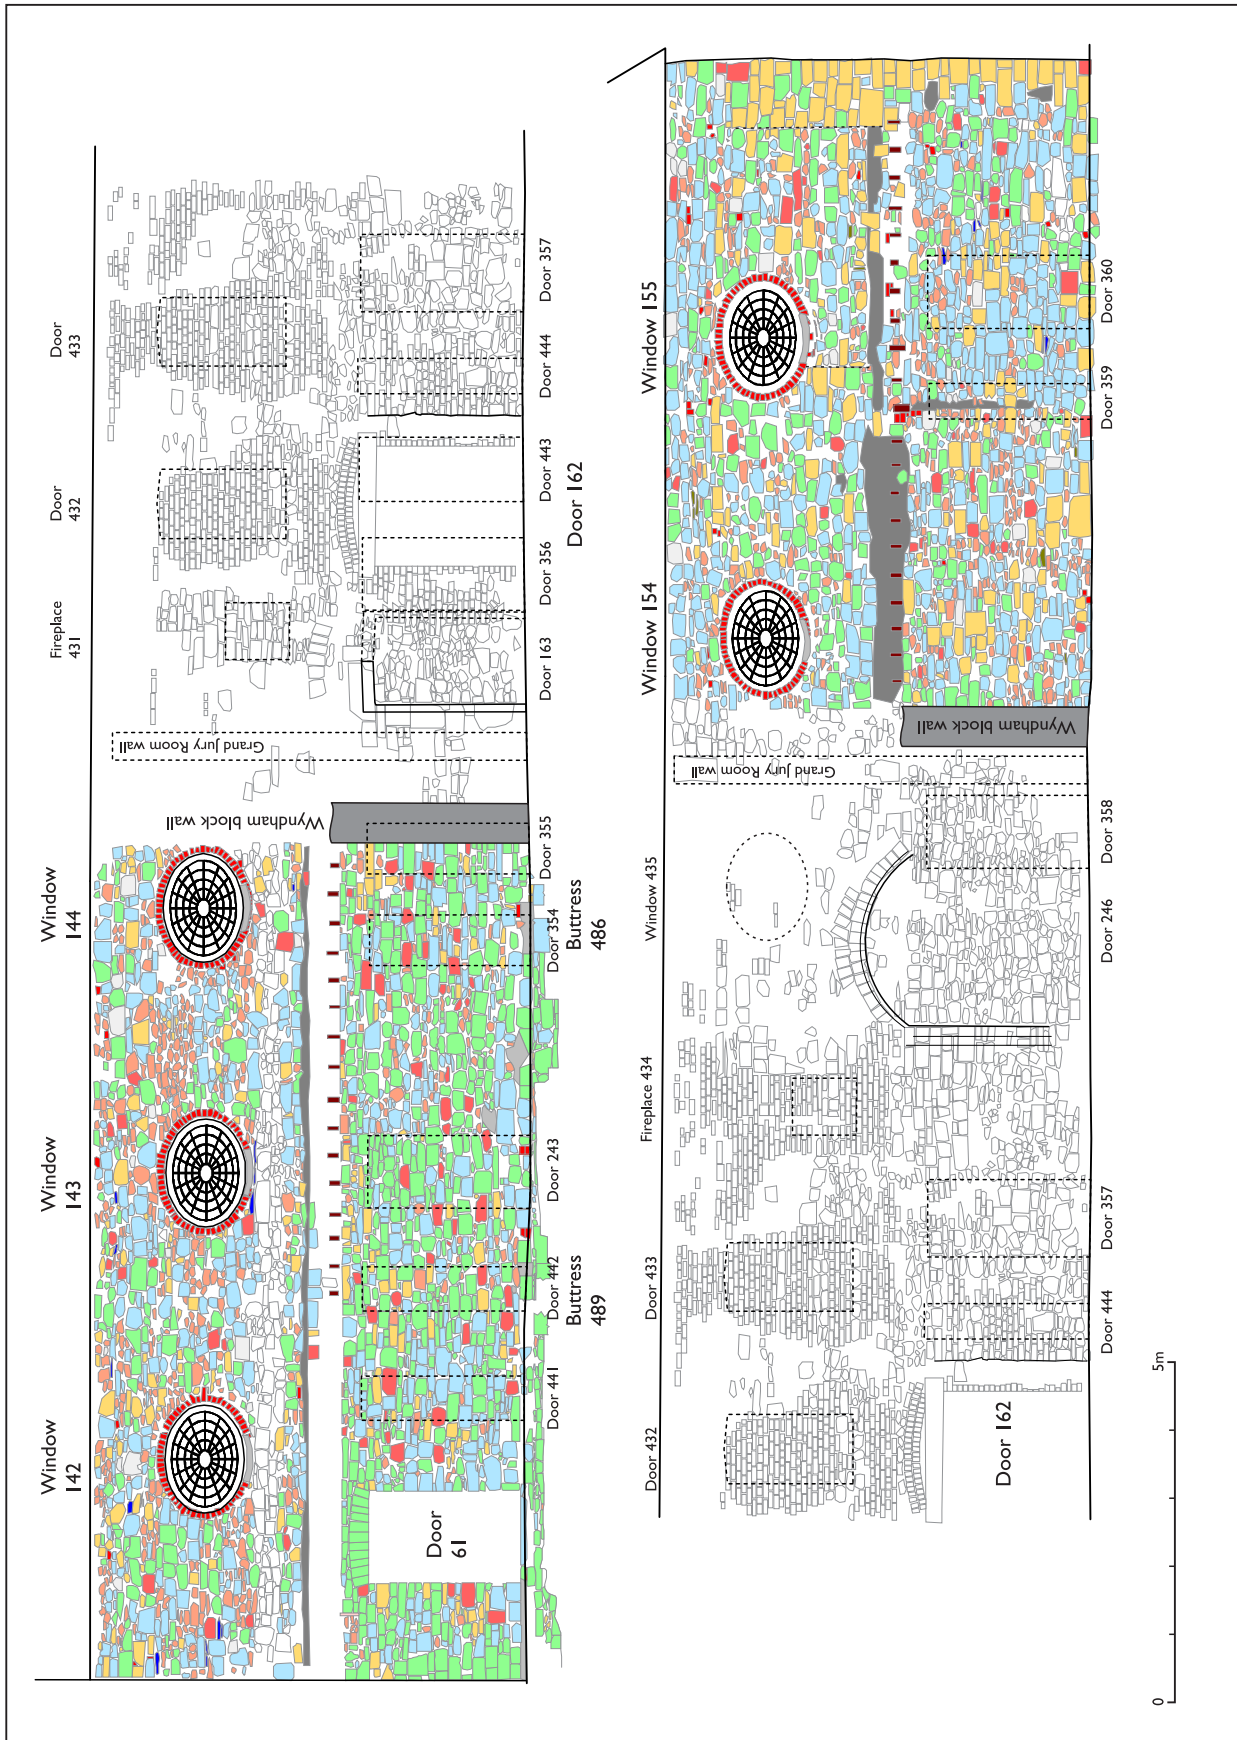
Elevation of exterior south wall of the Great Hall. See Figure 3 on page 4 for key to colours. Areas of small chert facing have not been recorded in detail. Stone identification was not possible in the Entrance Block as the ground floor was painted and the first floor has been drawn from rectified 1931 photographs.
